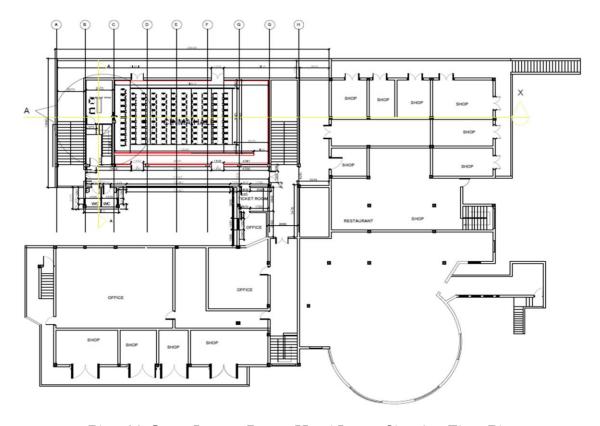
Green Legacy Resort Hotel Image Showing Floor Plan
